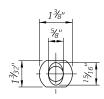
DETAIL 'S' - HALF SPACING ELEVATION (AS REQ'D. PER THE PLANS)
